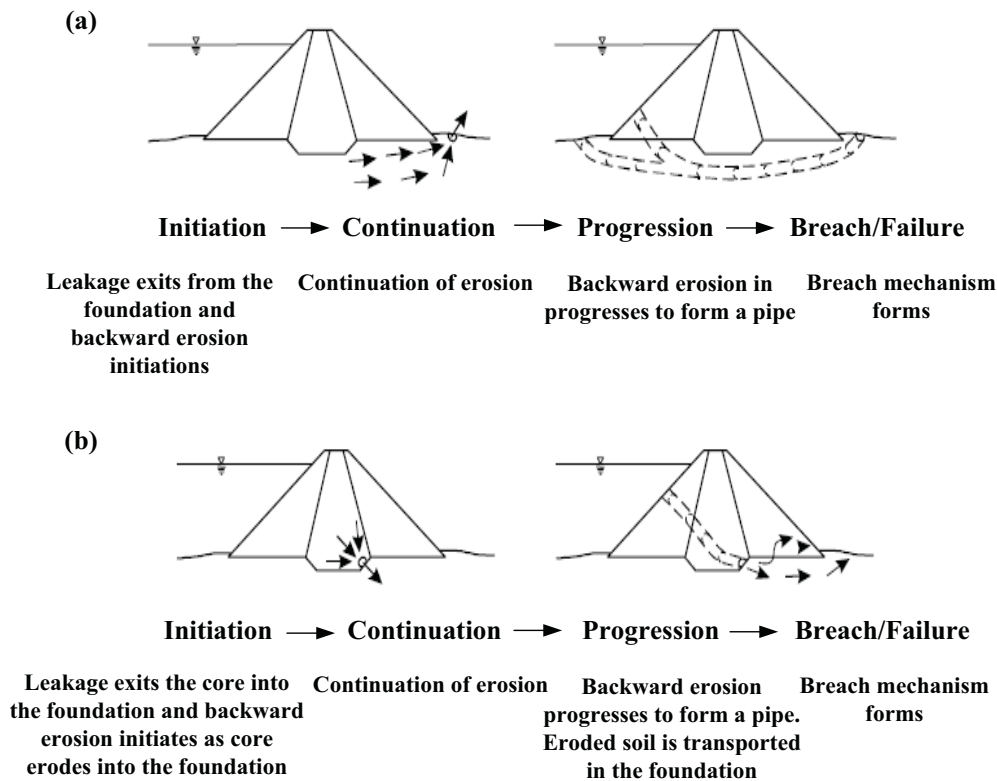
Models for the development of failure by piping in the foundation and from the embankment to the foundation [18]. a) Piping in the foundation initiated by backwards erosion. b) Piping from the embankment to foundation initiated by backwards erosion.
